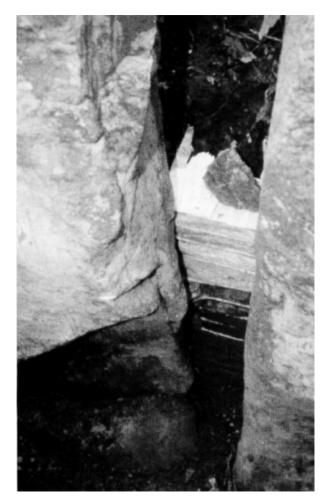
In connection with the rebuilding of the dry walling under restoration work experiments were carried out with the use of birch bark, both between the original, re-used slabs and between newly shaped additions. Previous softening of the bark in water made handling easier. Passage grave north of Birkerød, 2000. Photo Torben Dehn.
